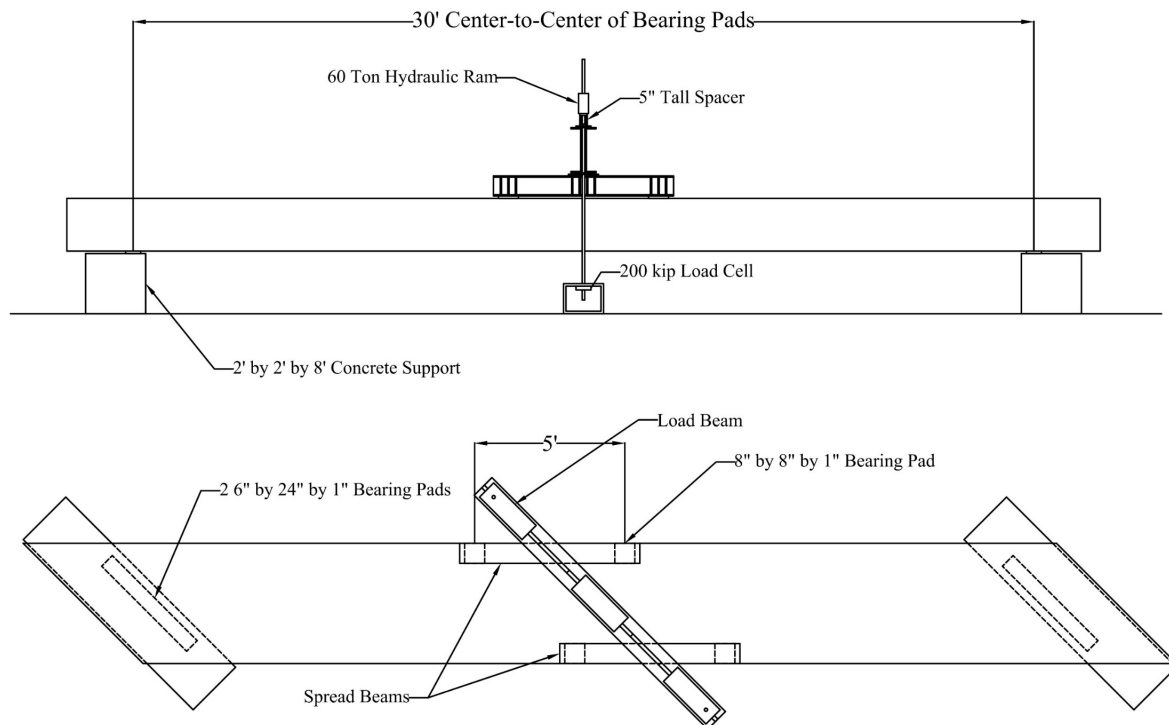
Laboratory setup for Rehoboth Bridge beams
